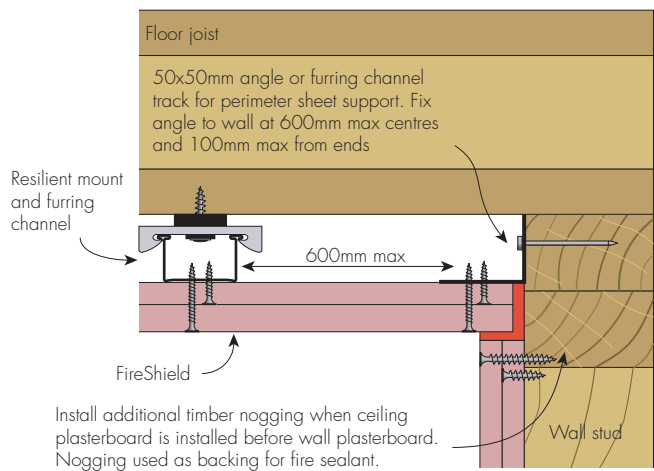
Fire Rated Ceiling to Wall – Alternate Detail
